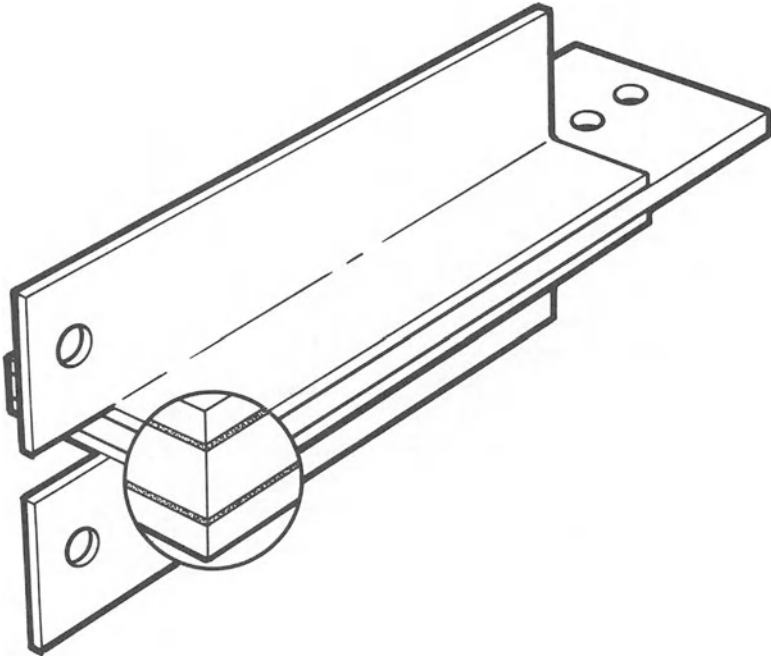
Typical construction of World Trade Center and Columbia Center damper
